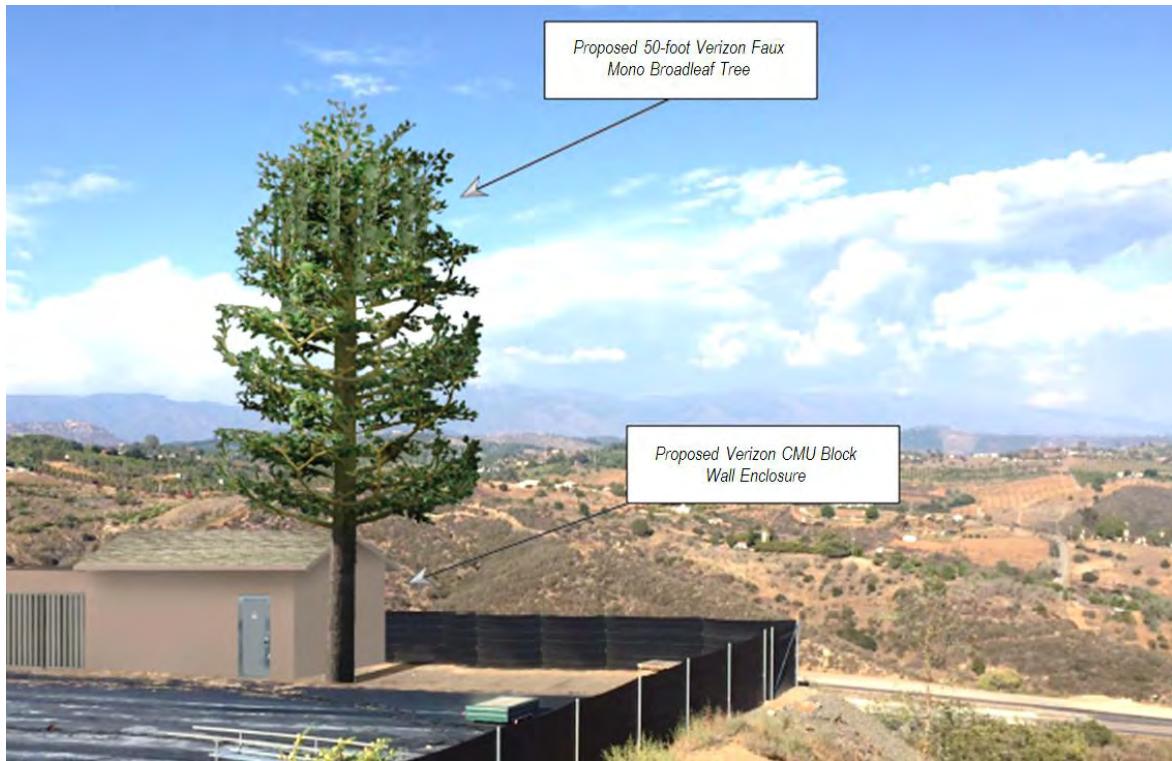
Original proposal, looking north-east at the 50-foot mono-broadleaf tree and the CMU block wall enclosure.
